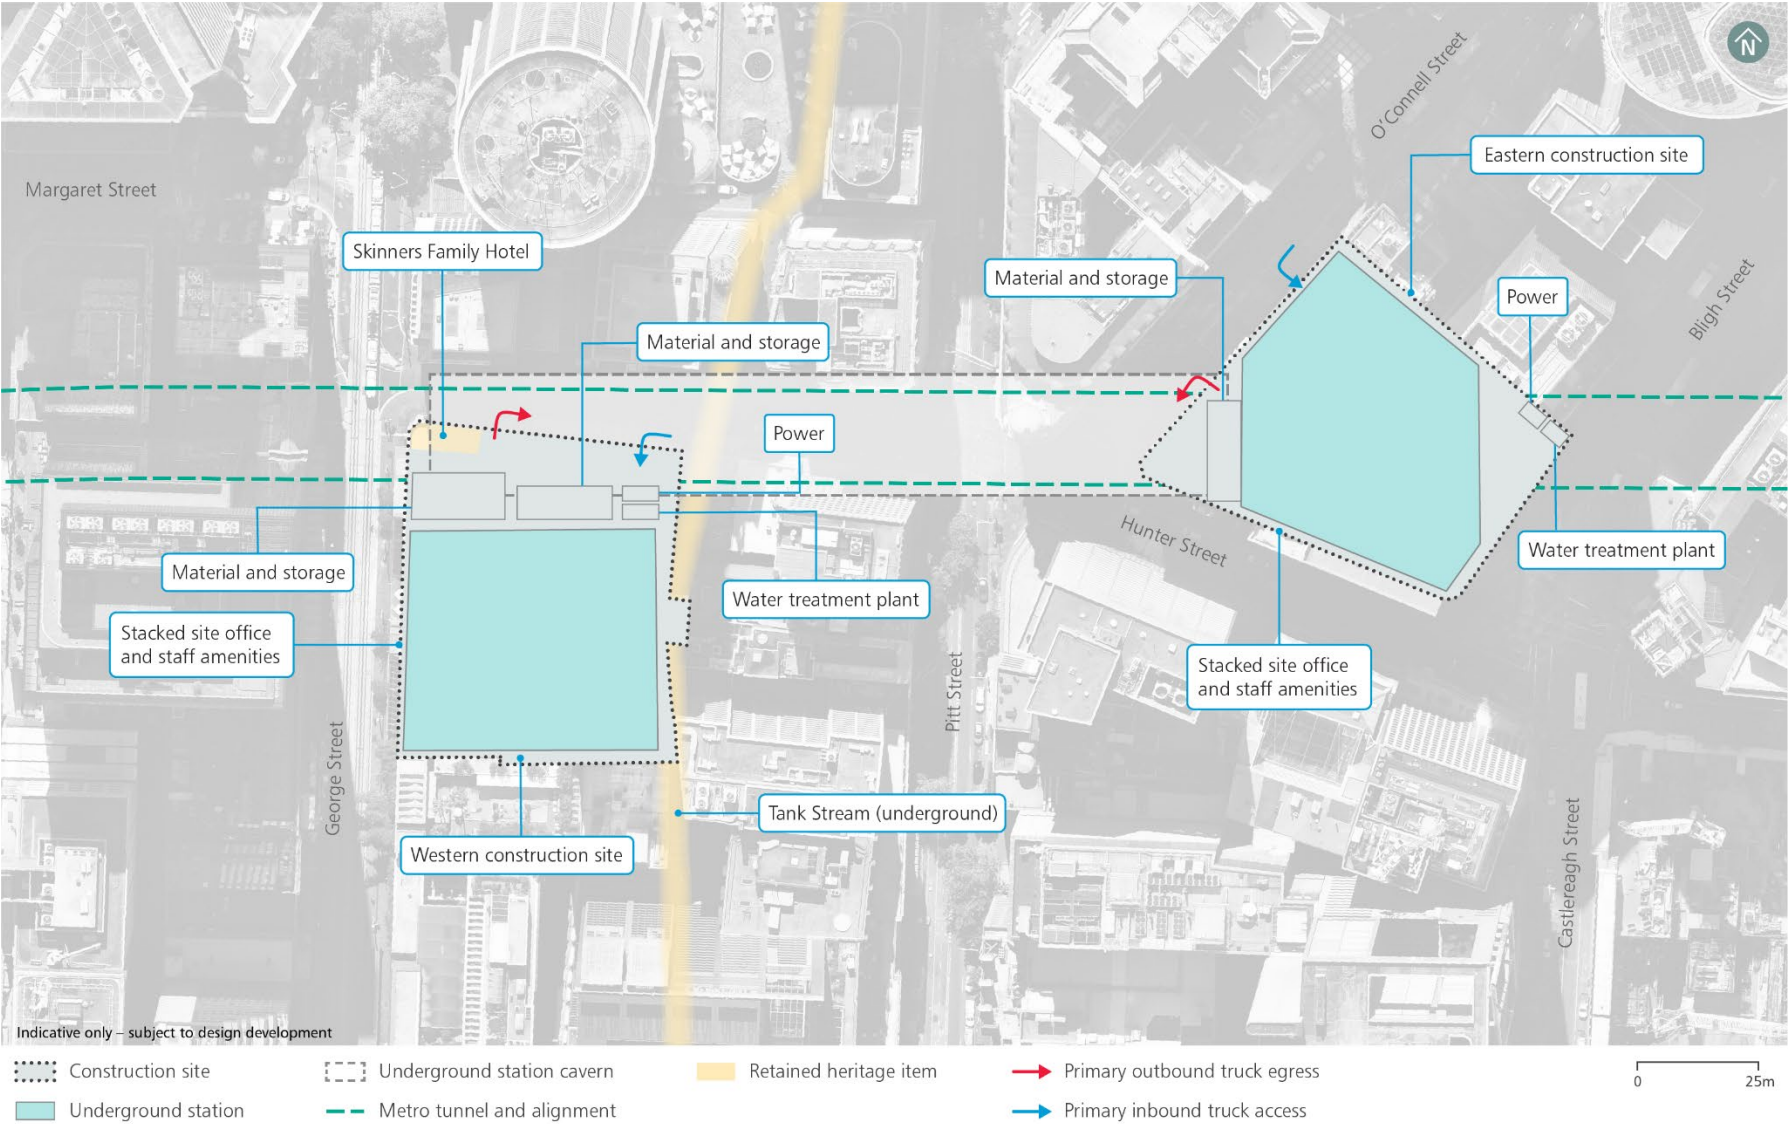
Indicative construction sites layout – Hunter Street Station (Sydney CBD)
